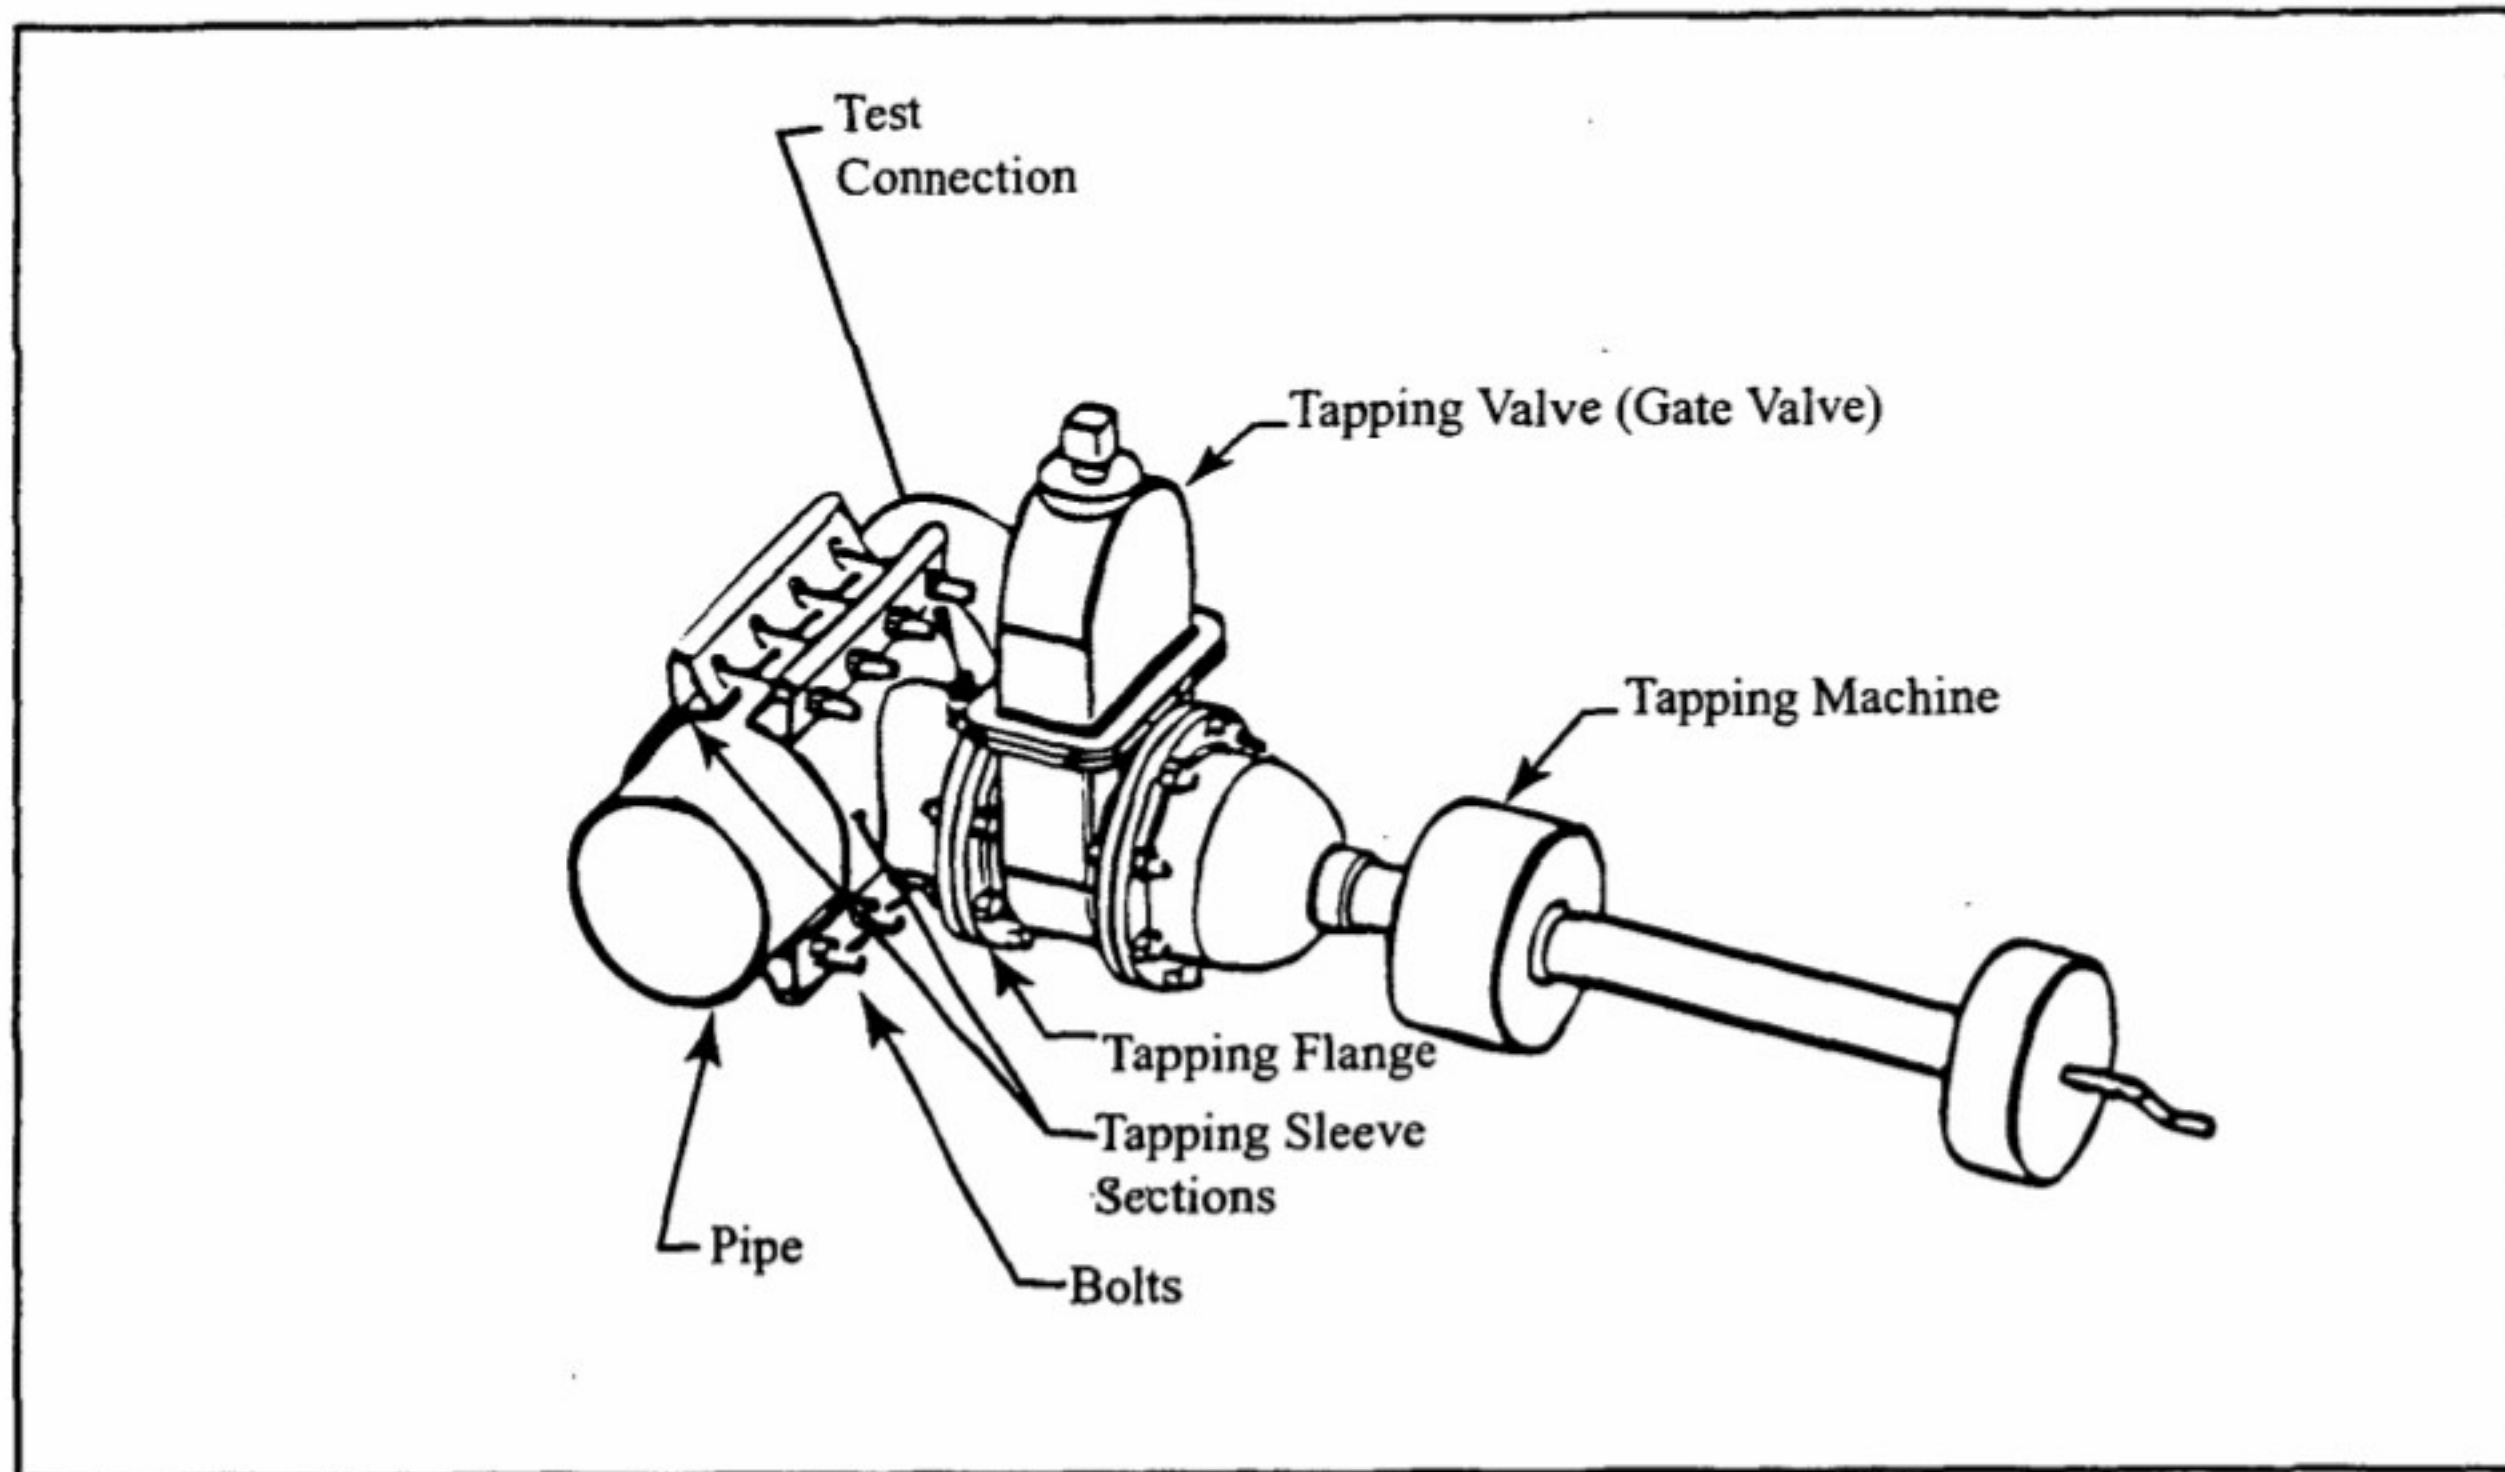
Typical fabricated tapping sleeve with valve and tapping machine
